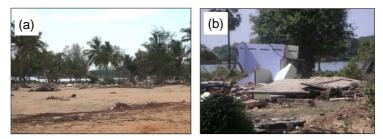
Ground photographs in Batticaloa. (a) Washed away buildings (b) Totally collapsed buildings
